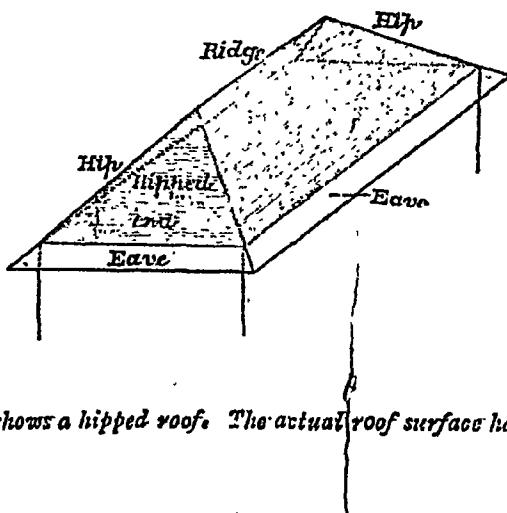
shows a hipped roof. The actual roof surface has been shaded.
